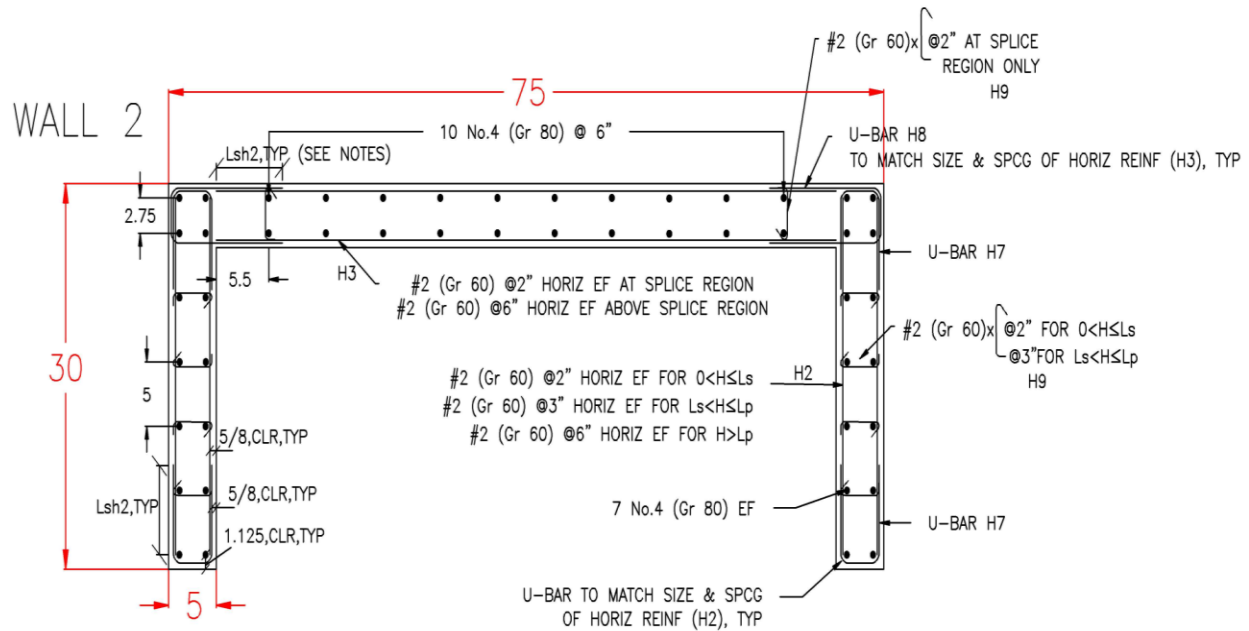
Ordinary wall cross-section (Unal et al., 2024)
